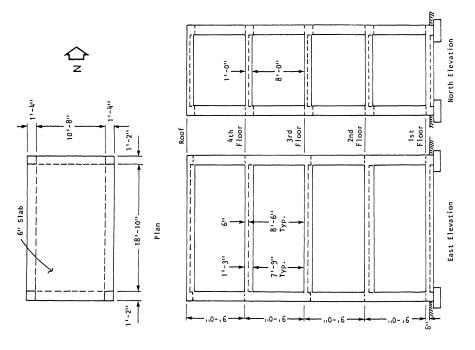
FOUR-STORY CONCRETE TEST STRUCTURE
